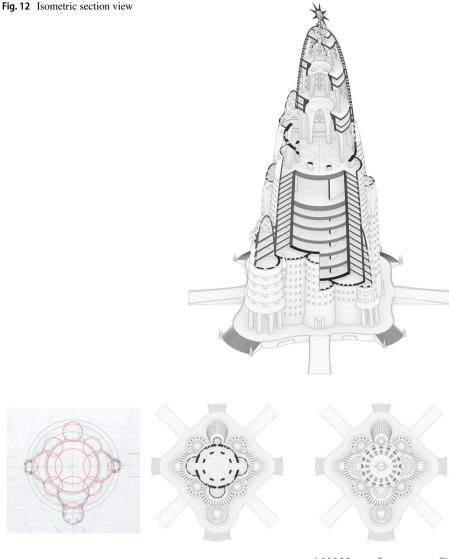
Geometric scheme, plan of the Hall of America and plan of roof. Source of the original sketch: archives of Cátedra Gaudí (Universitat Politécnica de Catalunya)
